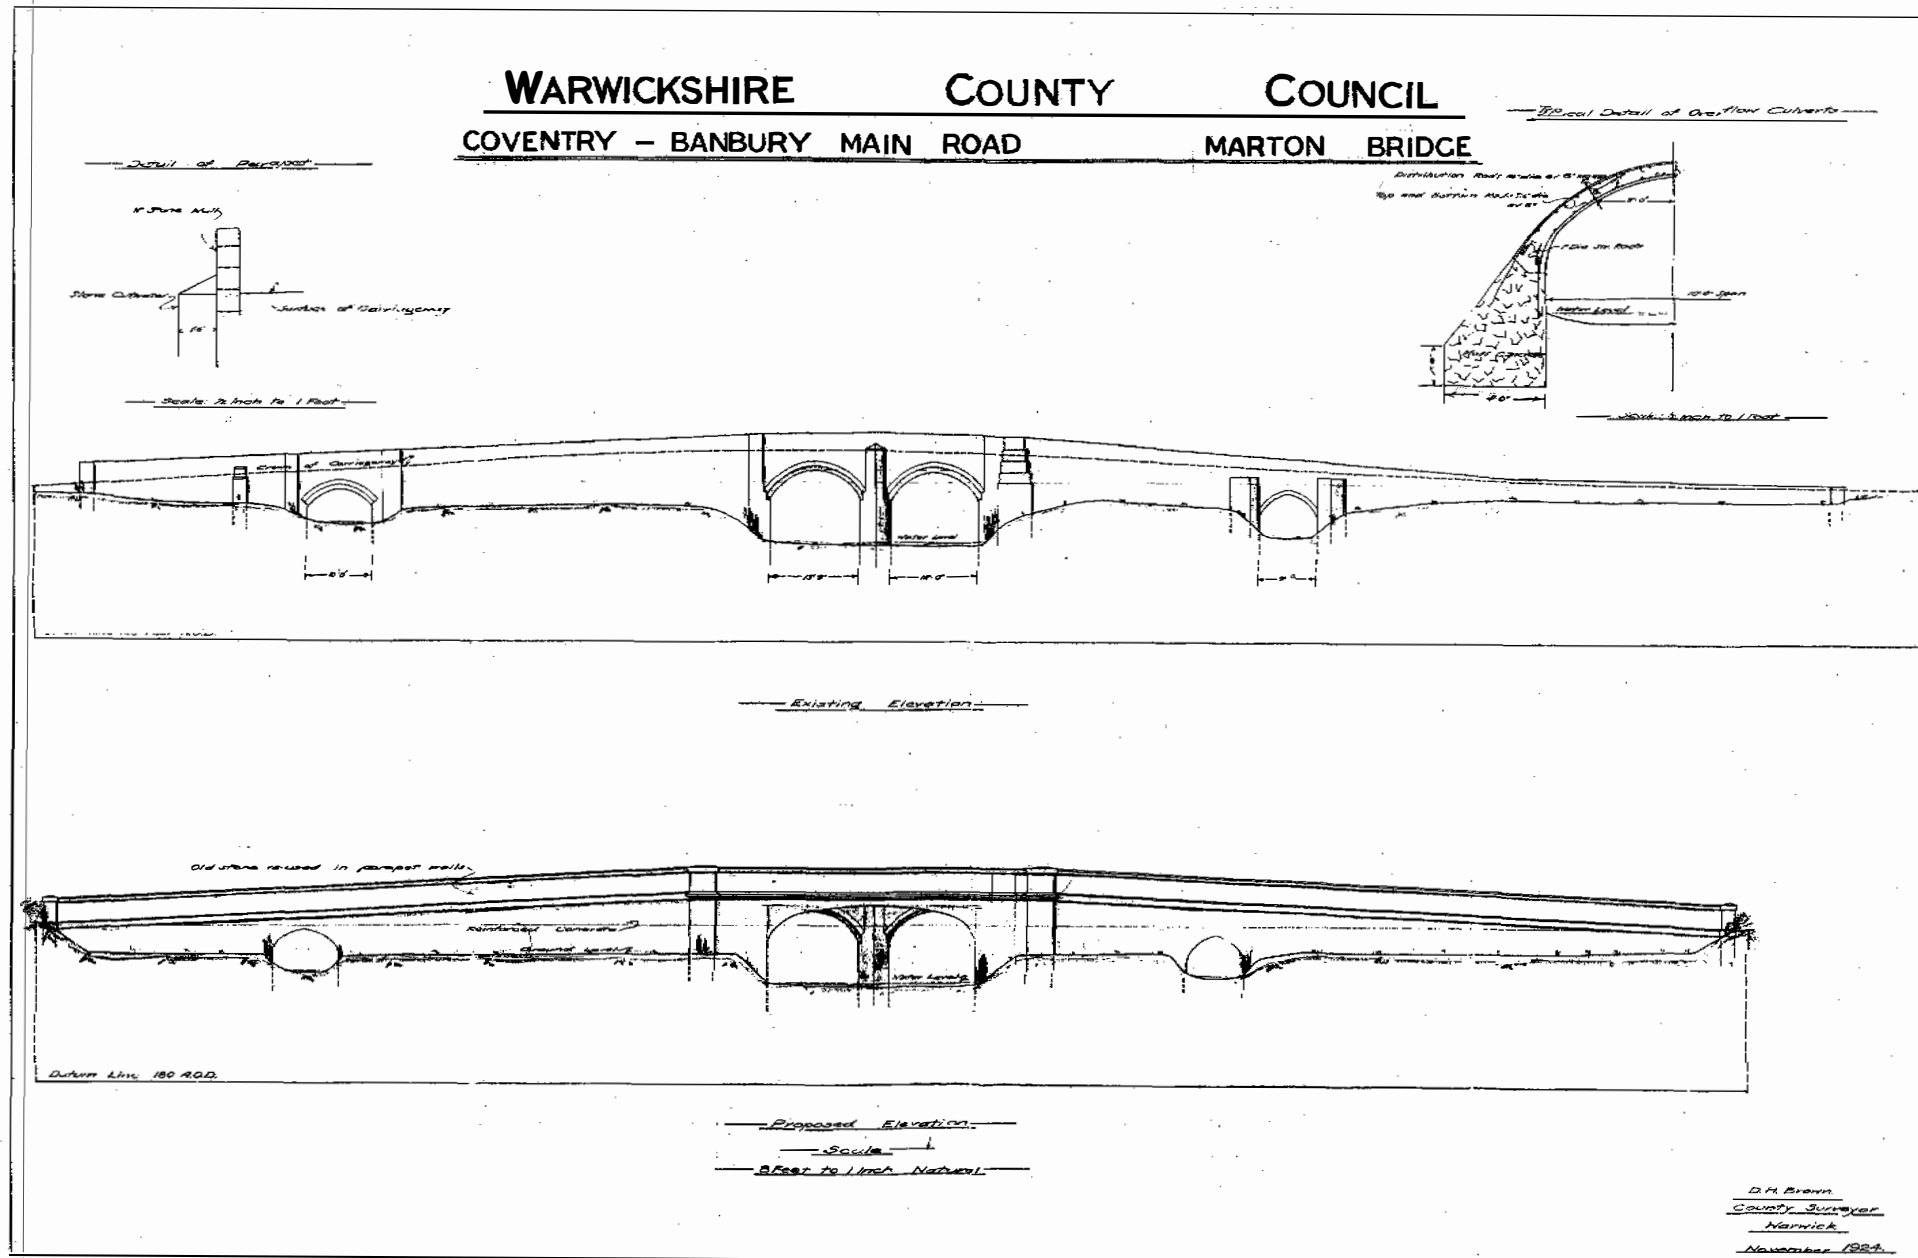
Marton Bridge, 1924, north elevation, existing and proposed (WCC Bridges Section 1924) [NB the proposed elevation differs from that actually built]
